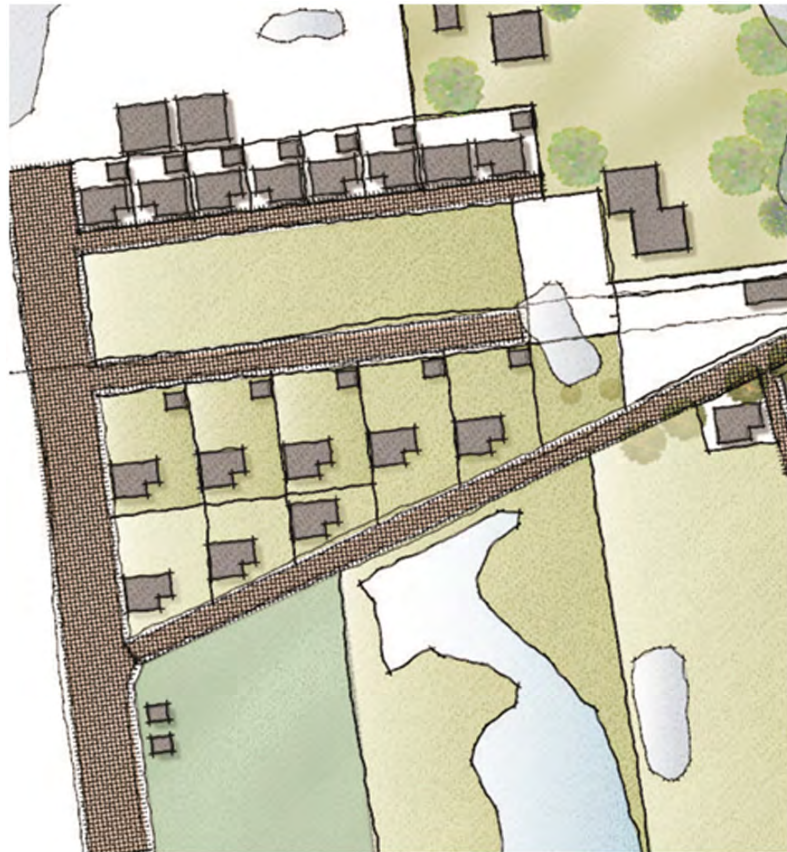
Area within the precinct where back yard gardening could be implemented (Source: drawing by author)
